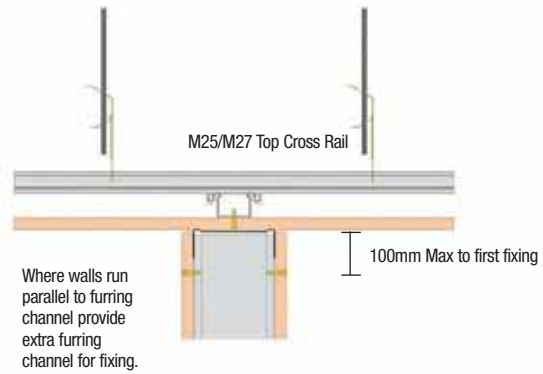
Concealed Ceiling with Wall Right Angles Connection Detail
